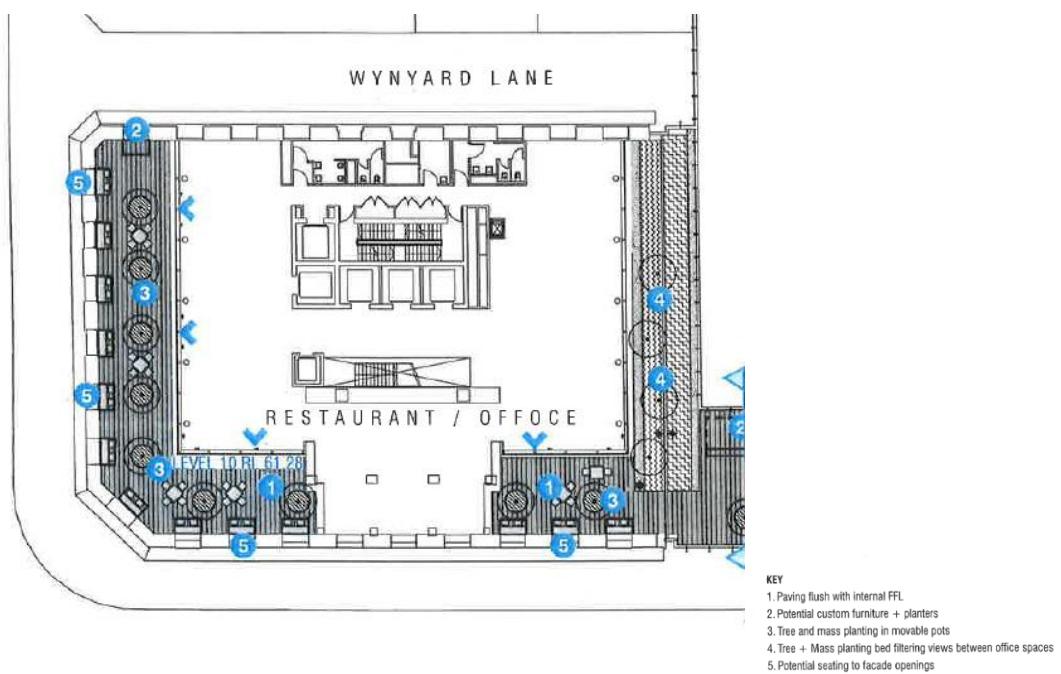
Approved landscape plan for terrace level 09 (Source: SSD 5824 Mod 4)
